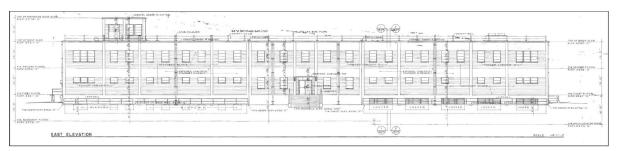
Elevation of the Communications Laboratory (Property 1622) from 1958 WS-HL plans.
